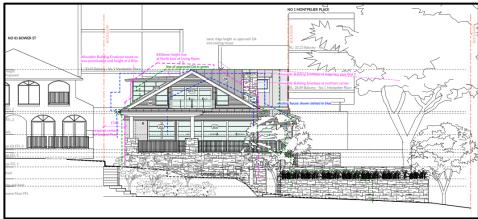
Northern Elevation (s4.55 plan set, dated March 2021)
